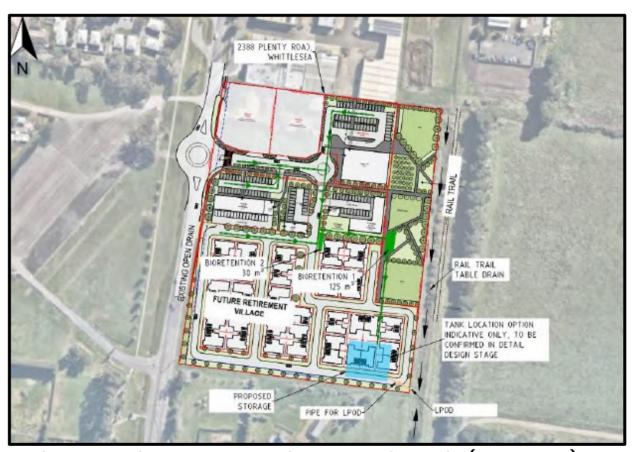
showing the proposed drainage system for the site (Source - DPM)
